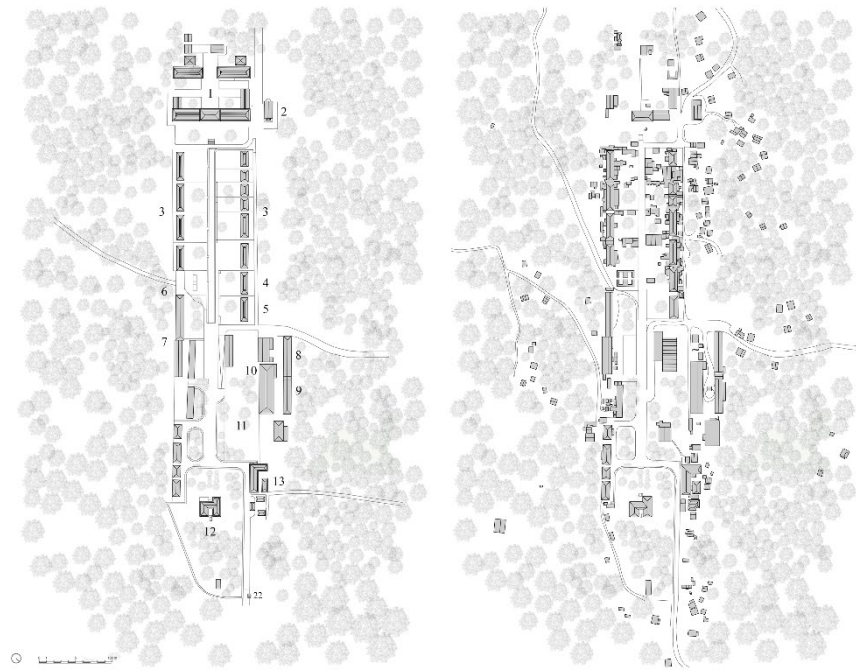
Roça Agostinho Neto: original layout (left); nowadays layout (right)
